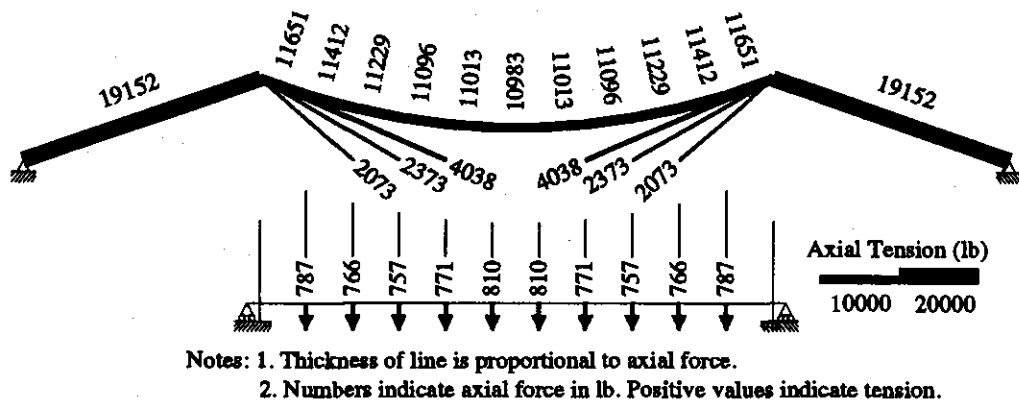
Dead Load Cable Forces of Rock Church Bridge with Lightly Stiffened Deck
